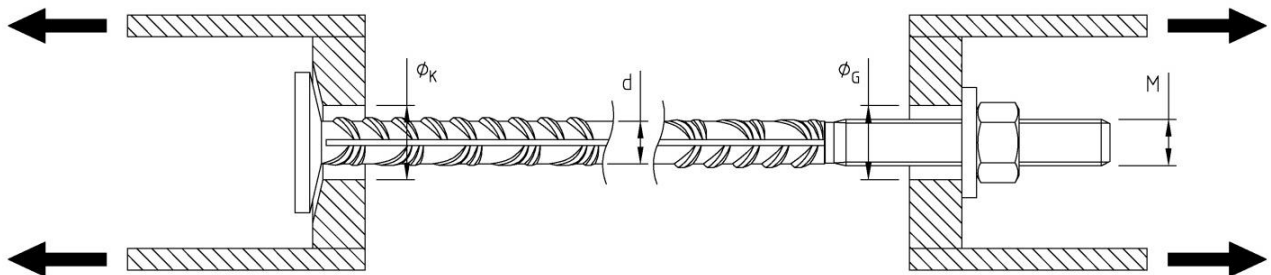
Sectional view of test rig for tension tests with bearing plates at both ends for anchor bolt type 1
